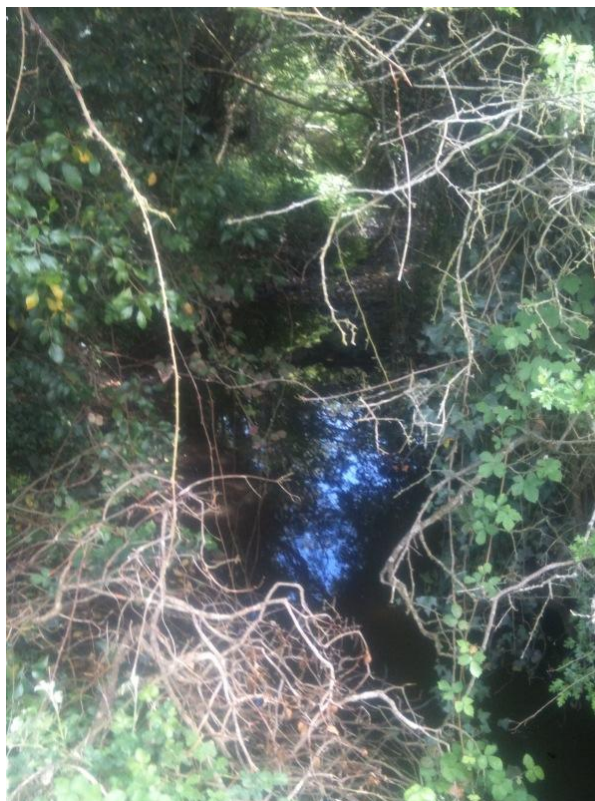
Downstream view of existing 1 m diameter culvert at western boundary perimeter fence at Ch. 5454
